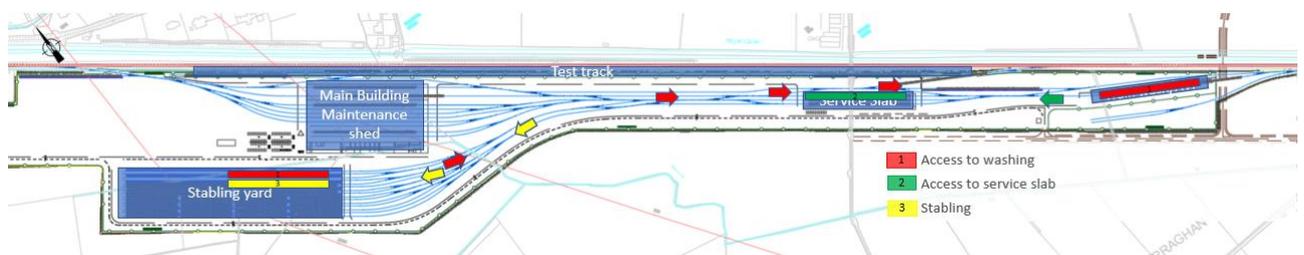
Movement 3: stabling → service/washing → stabling (Alternative 1)
